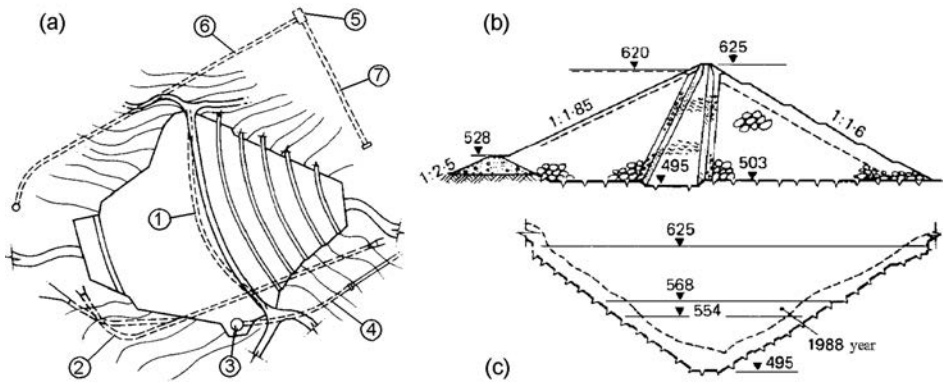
Layout plan (a), cross-section (b) and longitudinal section (c) of Maru dam (after Stematiu et al., 1991). (1) Grouting gallery; (2) diversion tunnel and bottom outlet; (3) shaft spillway, 668 m<sup>3</sup>/s; (4) overflow tunnel; (5) underground hydroelectric power station, 80 MW; (6) main headrace tunnel; (7) access gallery.
